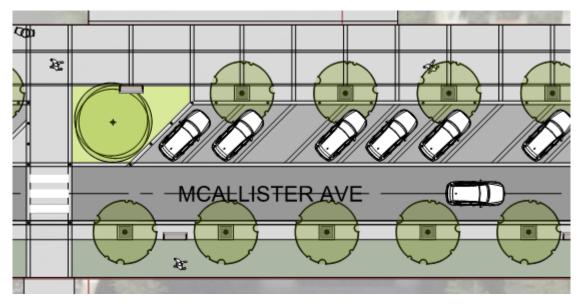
Typical layout of travel lane (Eastbound), MUP on South Side and Angled Parking on North Side
